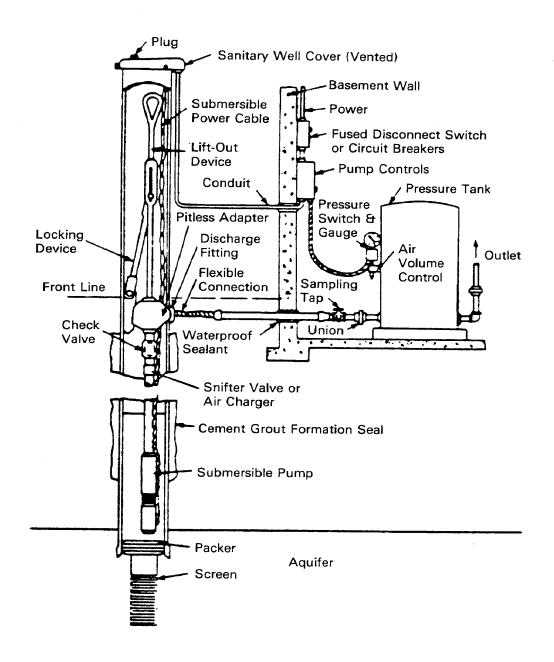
Pitless Adapter with Submersible Pump Installation for Basement Storage
